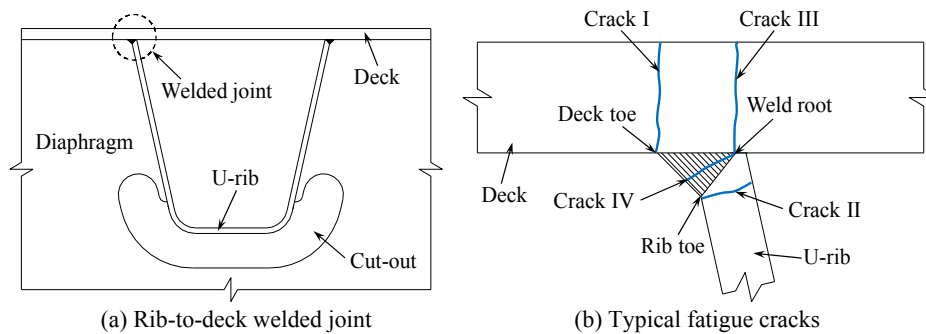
Typical fatigue cracks at a rib-to-deck welded joint of an OSD.
